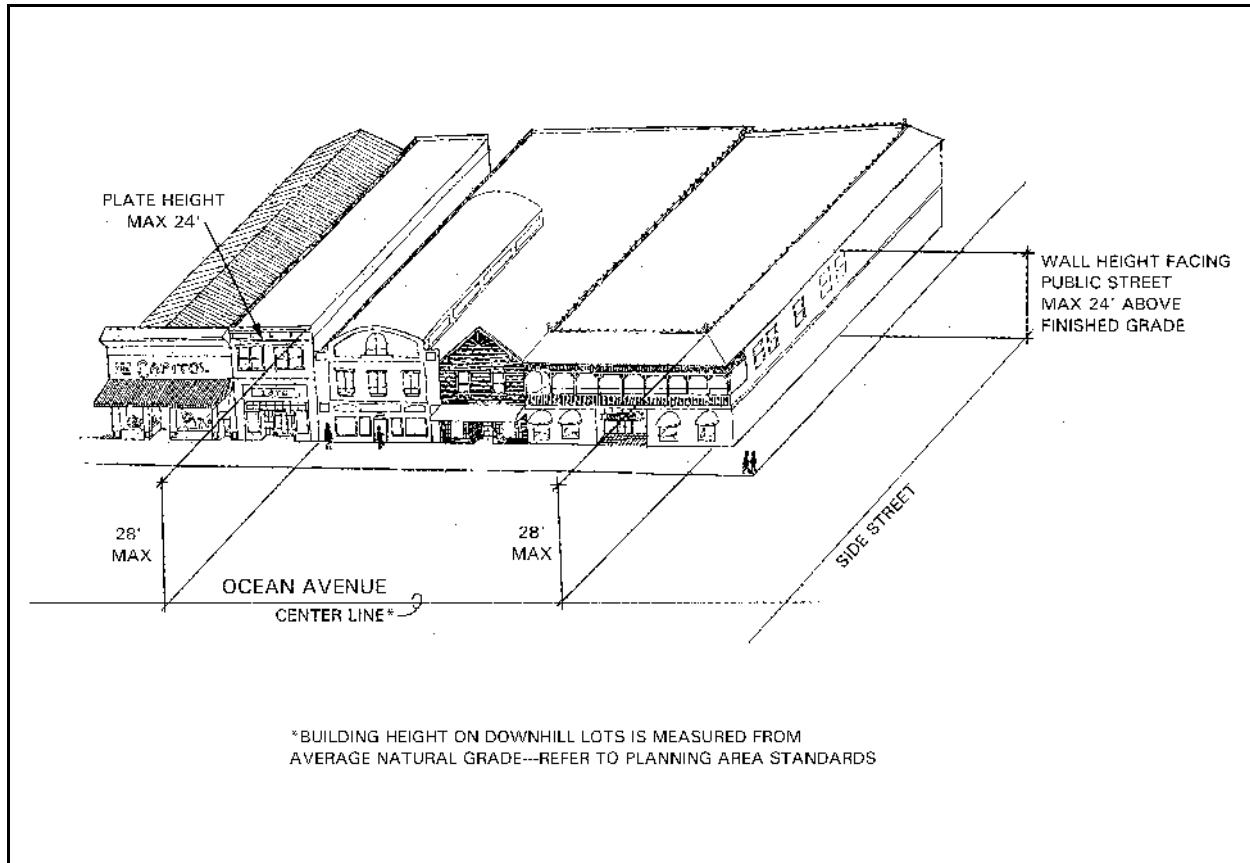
Building Height, Mass and Scale on Ocean Avenue in Central Business District
